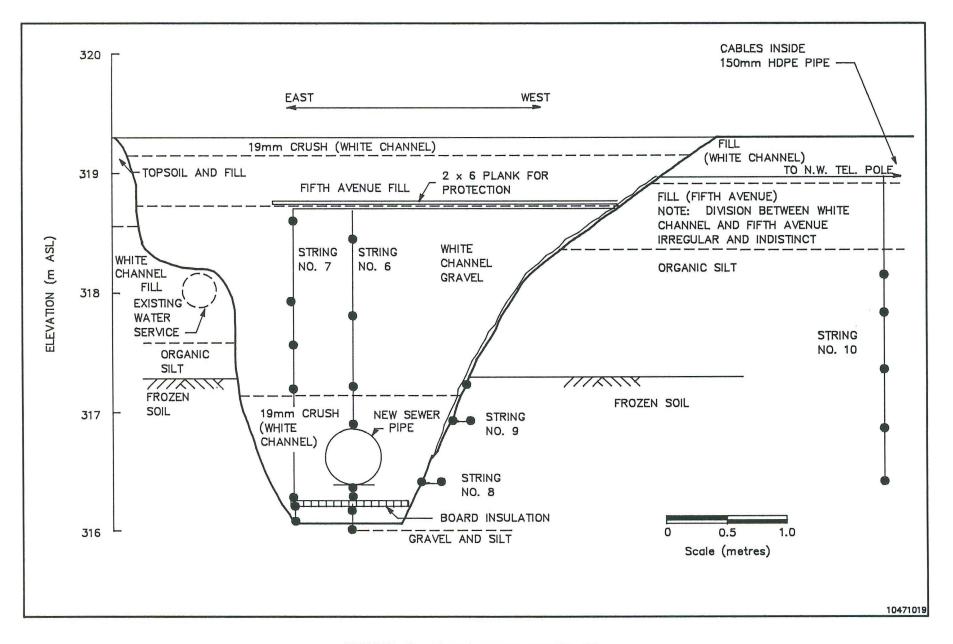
THERMISTOR SUITE #2 FIFTH AVENUE AT ROBERT SERVICE SCHOOL INSTALLED CONFIGURATION CROSS-SECTION FACING SOUTH
